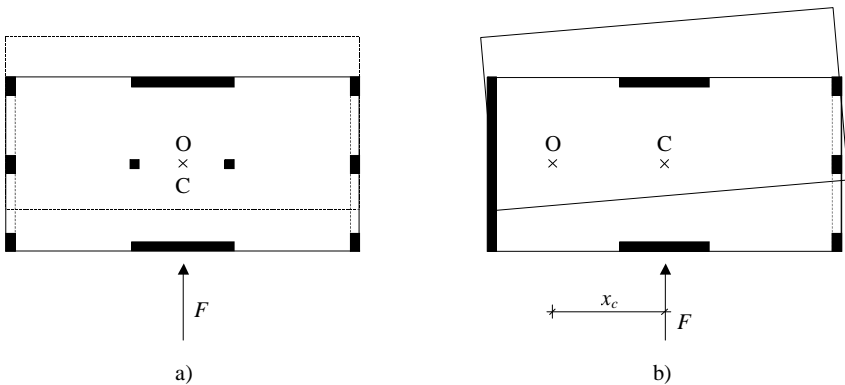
Plan arrangement. a) symmetric, b) asymmetric.
